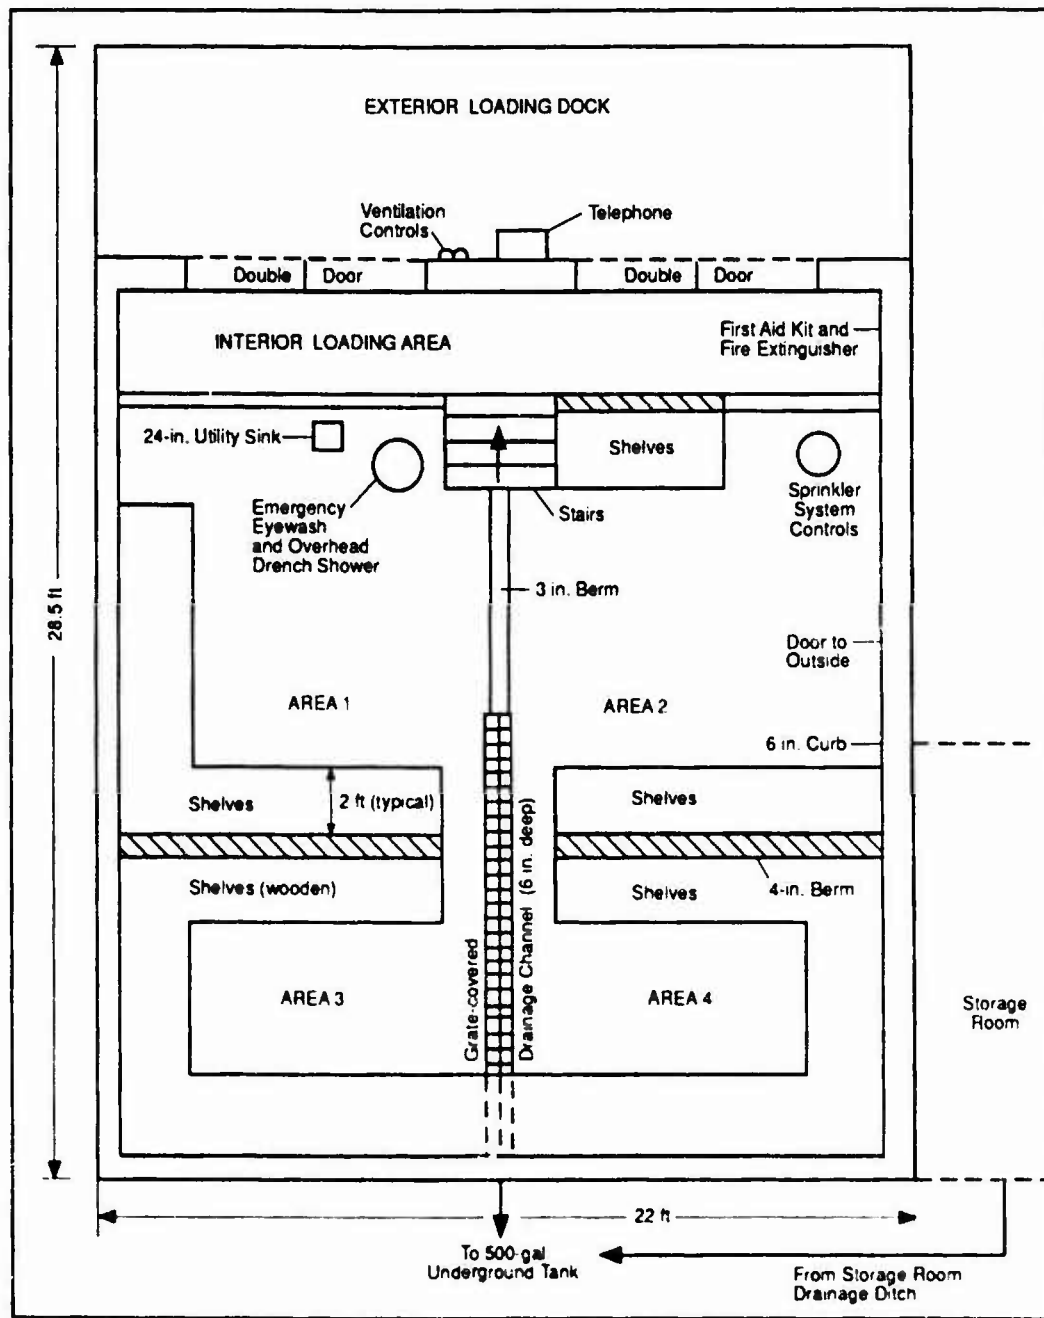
Layout of Site 41, the Lab-Pack Repacking Facility at Building 1094 (Source: Adapted from USACE 1984b)
